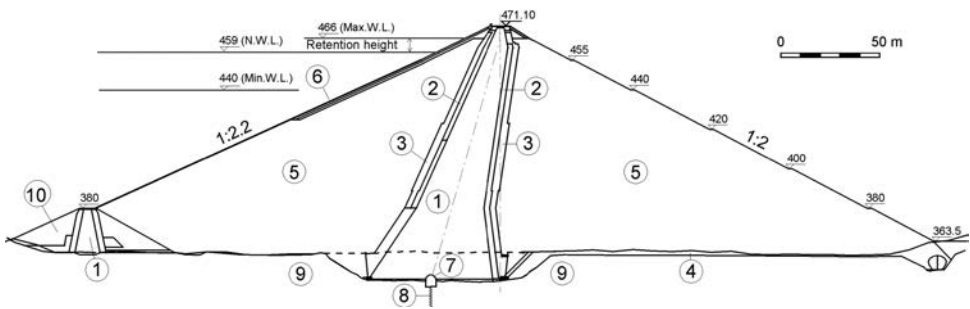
Main cross-section of Kozyak Dam. (1) Clay core; (2) first transition zone; (3) second transition zone; (4) river deposit; (5) rockfill shells (limestone); (6) arranged slope protective stones; (7) grouting gallery; (8) grout curtain; (9) rock foundation (limestone); (10) gravel in the upstream cofferdam.
